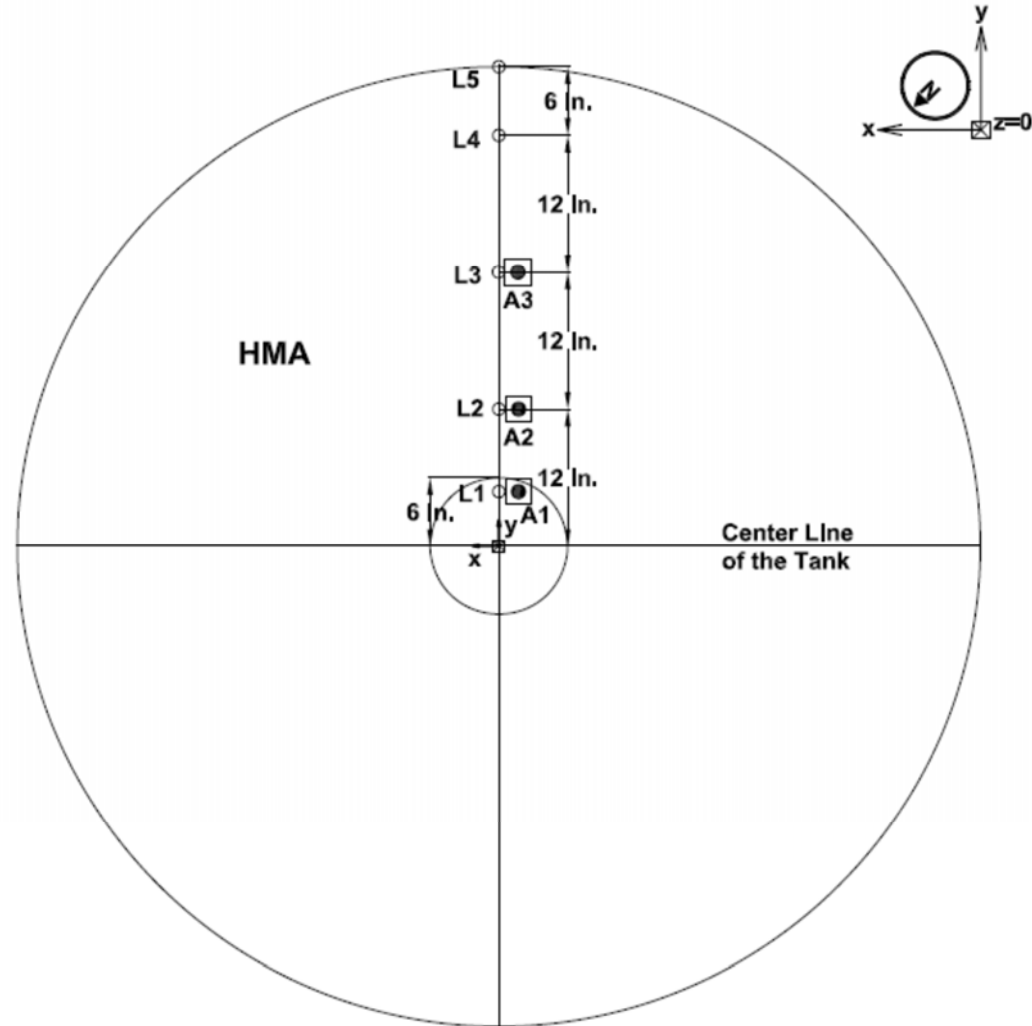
Instrumentation plan for experiment No. 4—Plan view at $Z = 0$ inch
